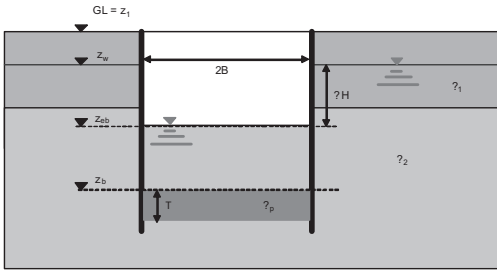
Typical section of stations, with plug injected at the toe of the D Walls.
